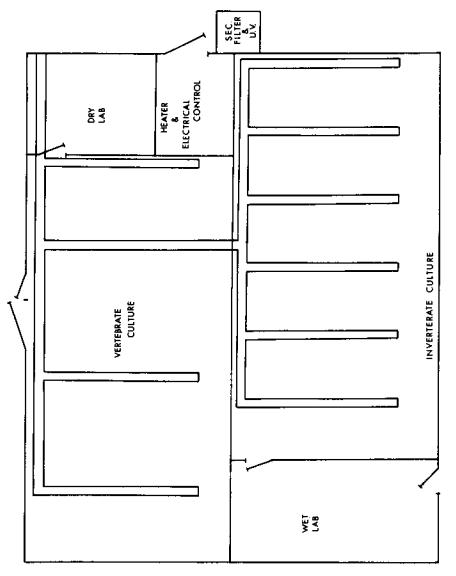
Floor plan of present culture facilities, Skidaway Institute of Oceanography, Savannah, Ga.
